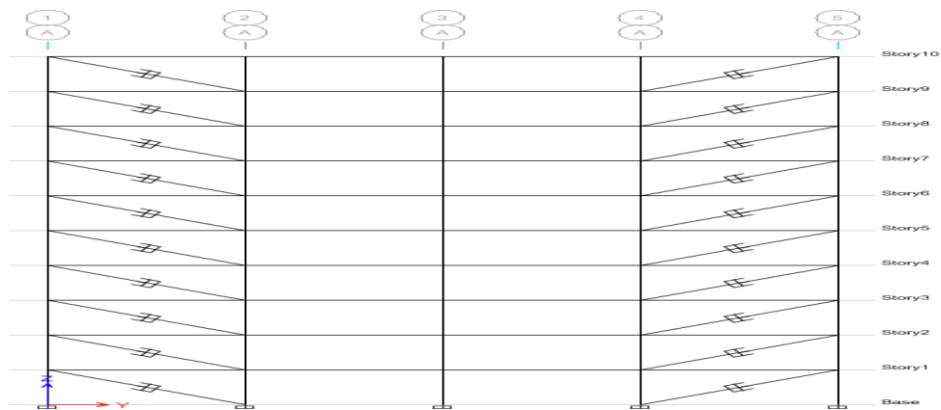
RBSC with FVD at Exterior Corners Elevation YZ-plane.
